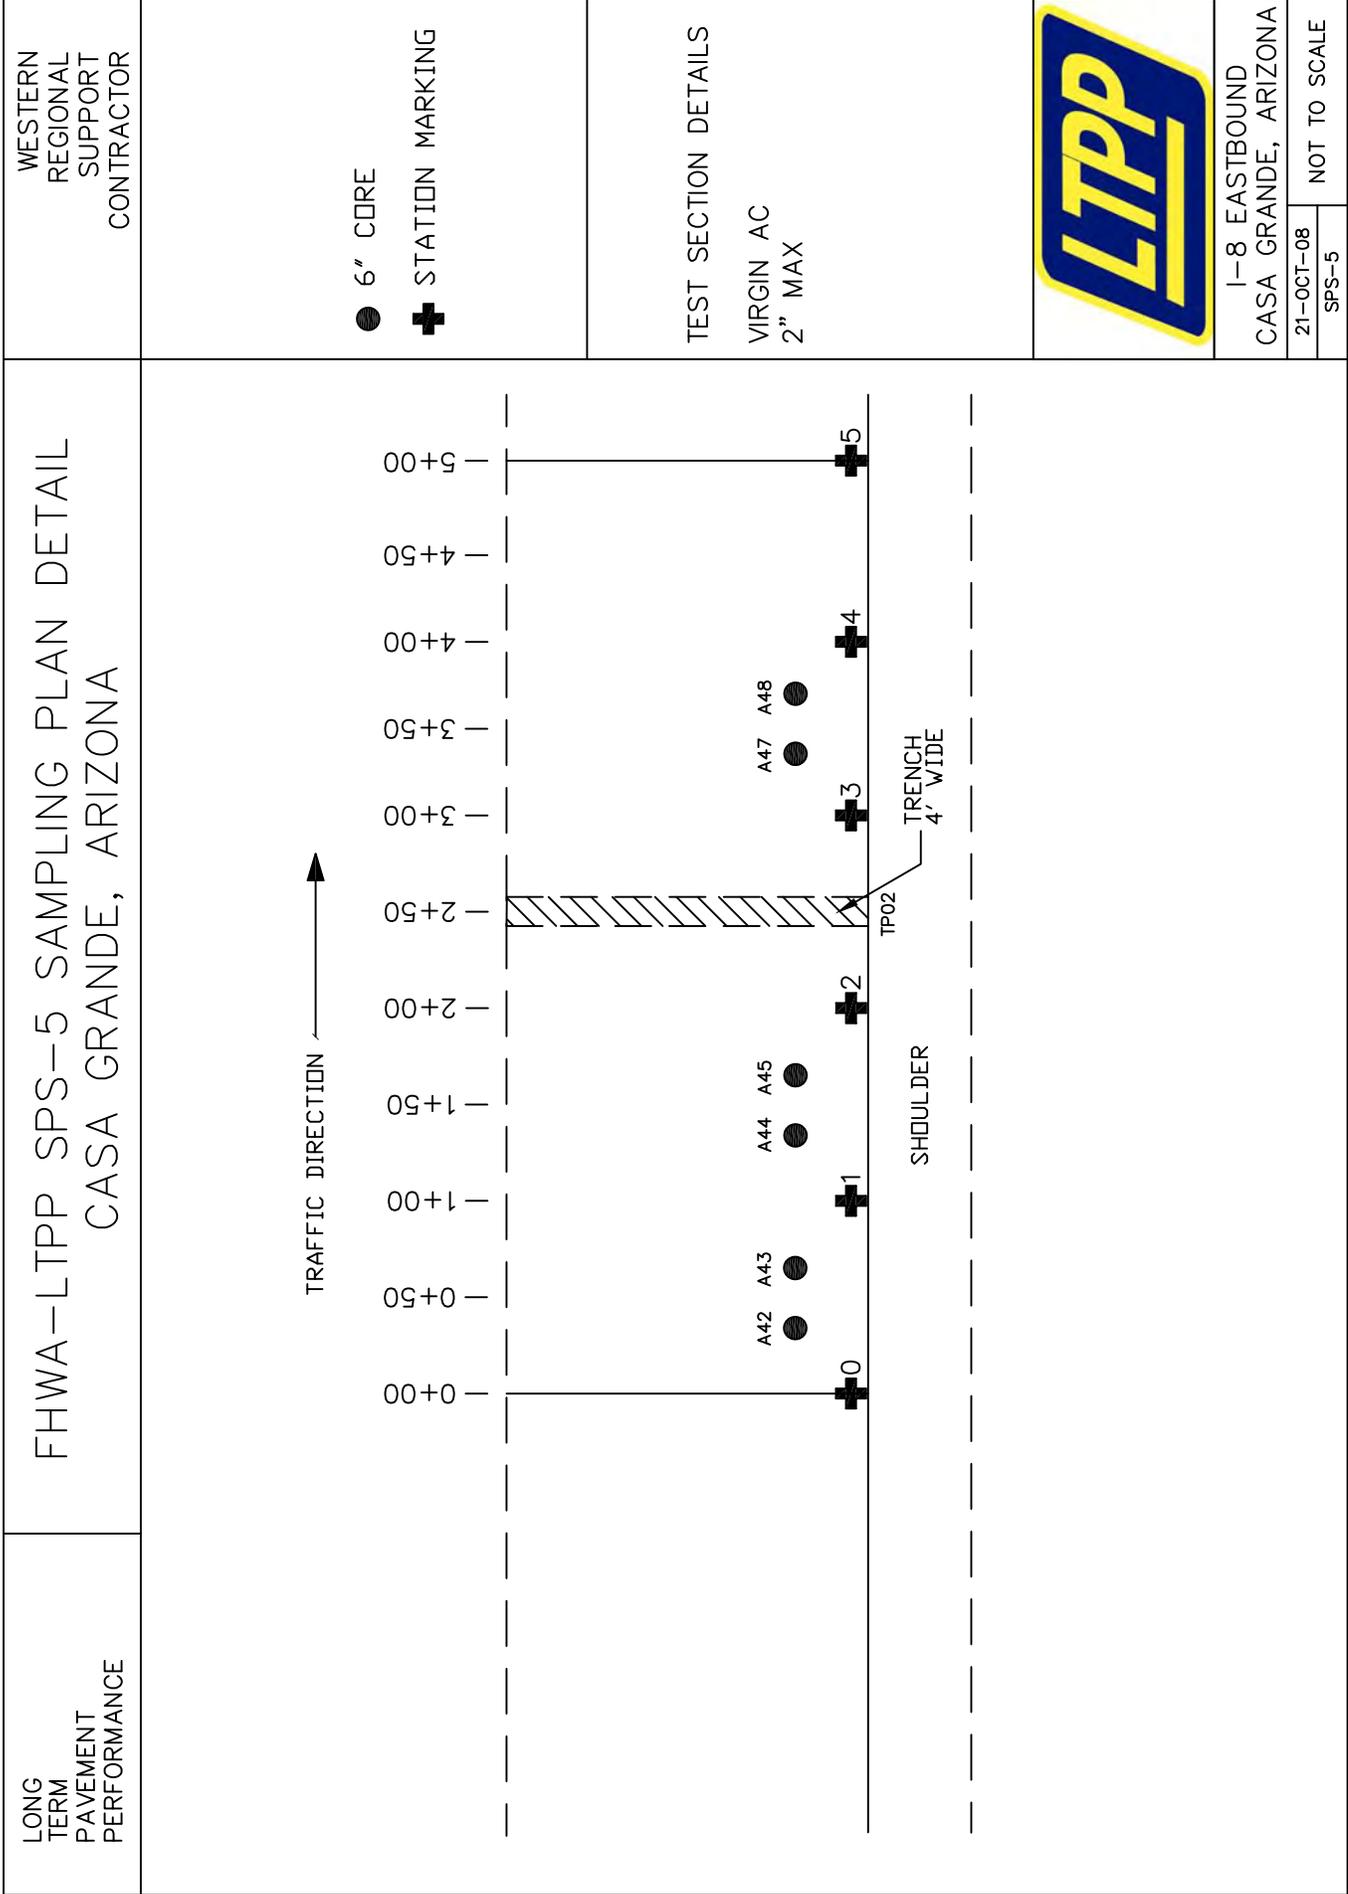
FORENSIC SAMPLING AND TESTING PLAN FOR SECTION 040505
